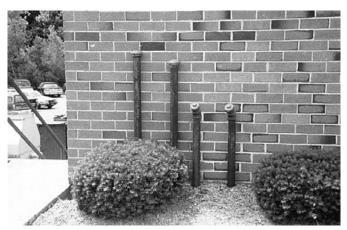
Two Fill and Vent Pipes Leading to Two Underground Storage Tanks
